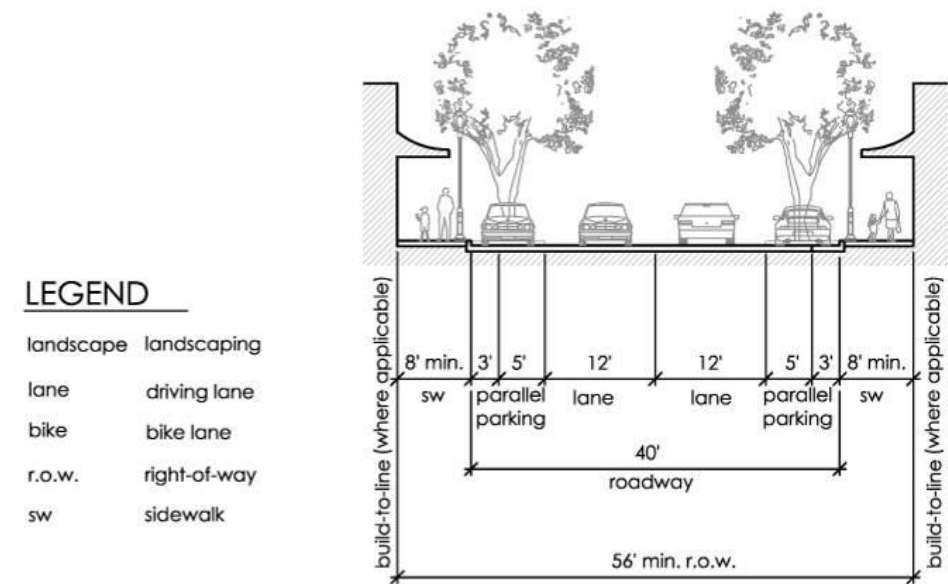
Typical Downtown Neighborhood Arterial Street
